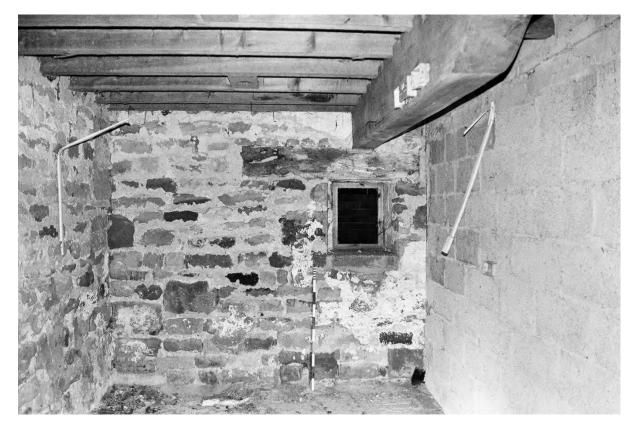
Farm Building 4: Room 4.2 Window (Film 7/19). Facing East.
